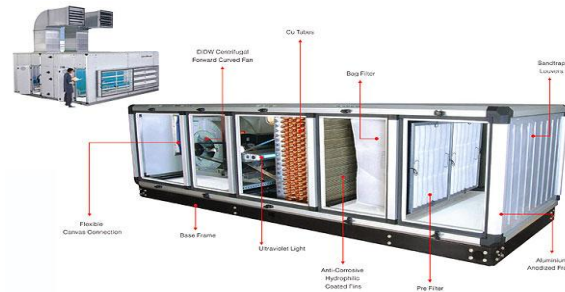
Typical cross section of double skin roof mounted A.H.U. [2]
